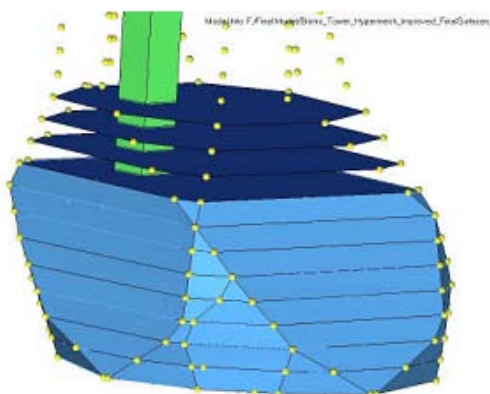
Floor plates modeled in hypermesh from surfaces defining the exterior envelope of the building
